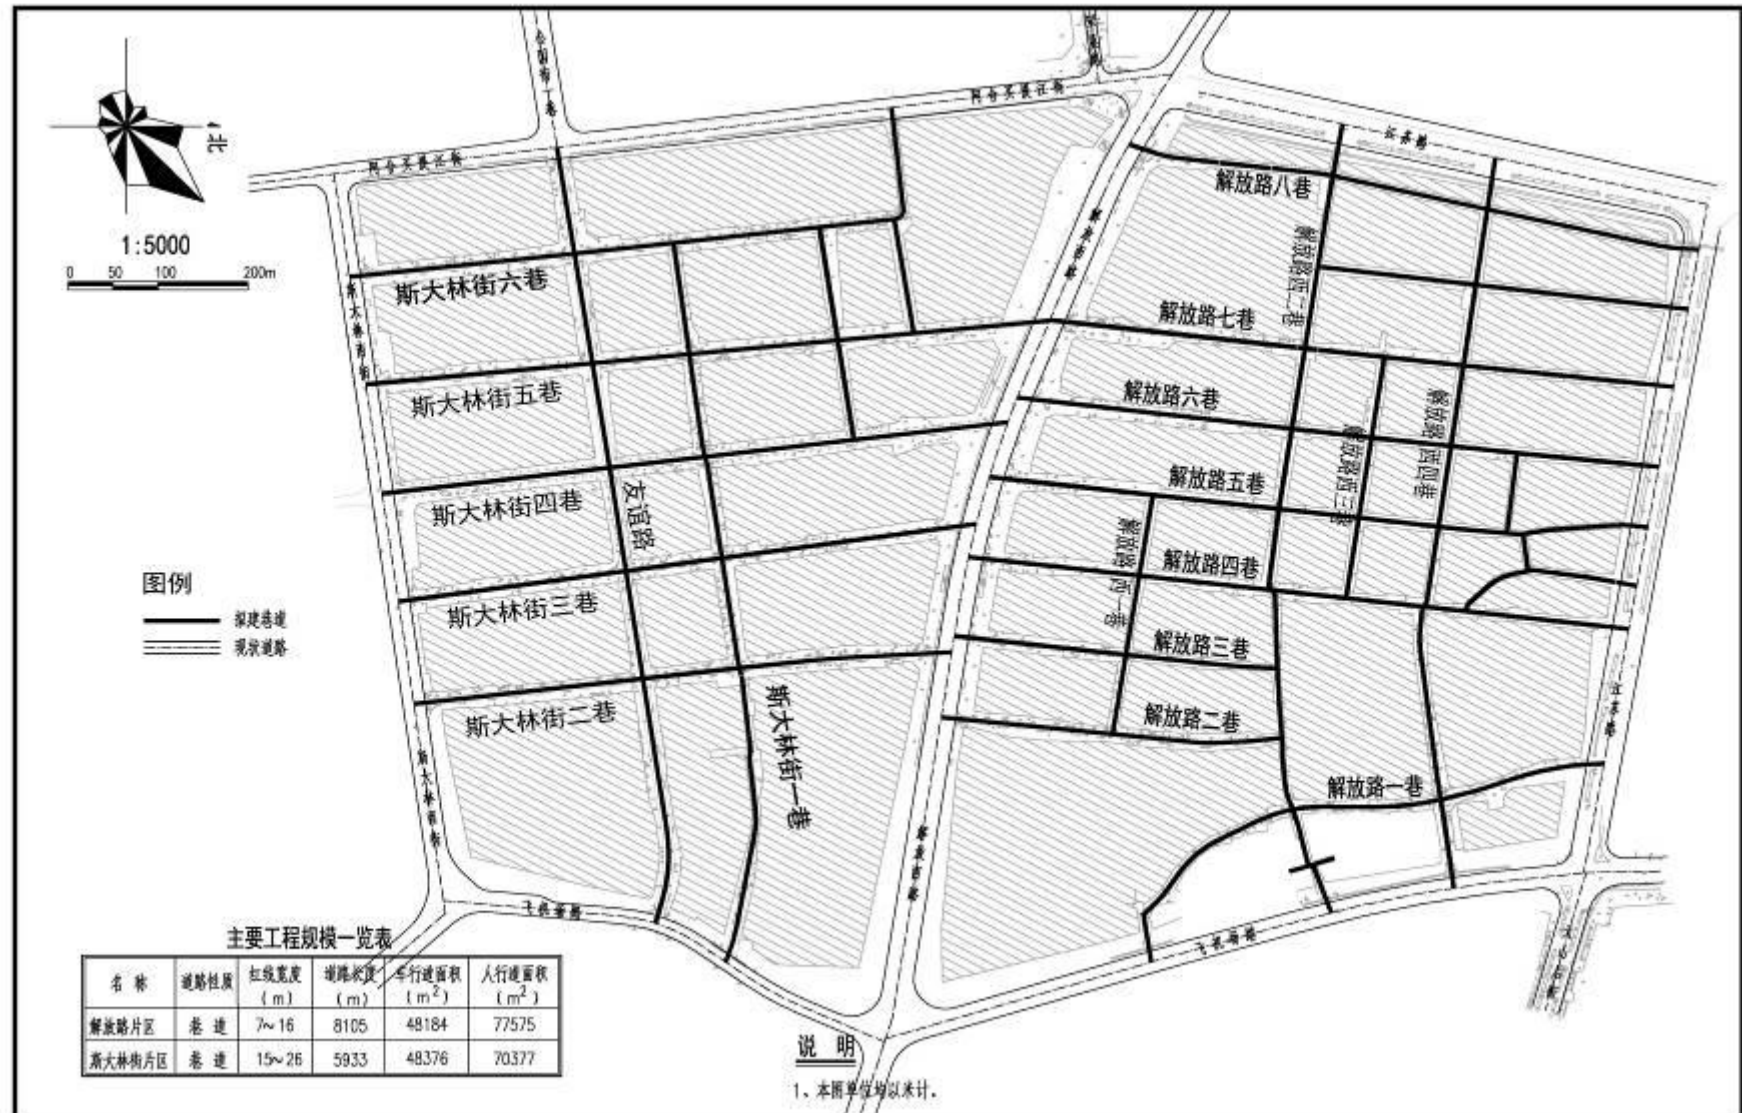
(a) Alleys reconstruction general layout in Jiefang road and Sidalin road
